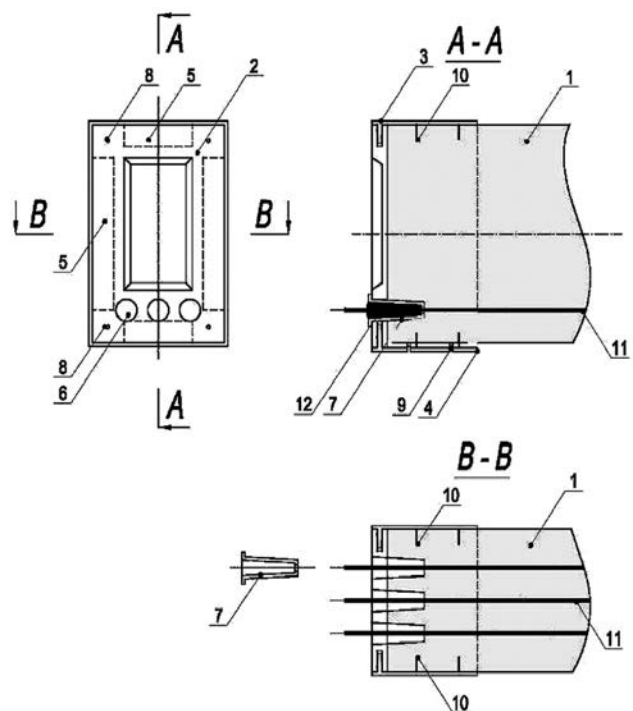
New arrangement of the timber beam reinforced with aramid cords: 1 – timber beam, 2 – front plate, 3, 4 – nail plates, 5 – cavity sockets, 6 – holes in the wooden beam, 7 – metal bushings, 8 – fastening screws, 9 – perforations to increase microventilation, 10 – nail plate fastener, 11 – aramid cords, 12 – epoxy adhesive [4]
